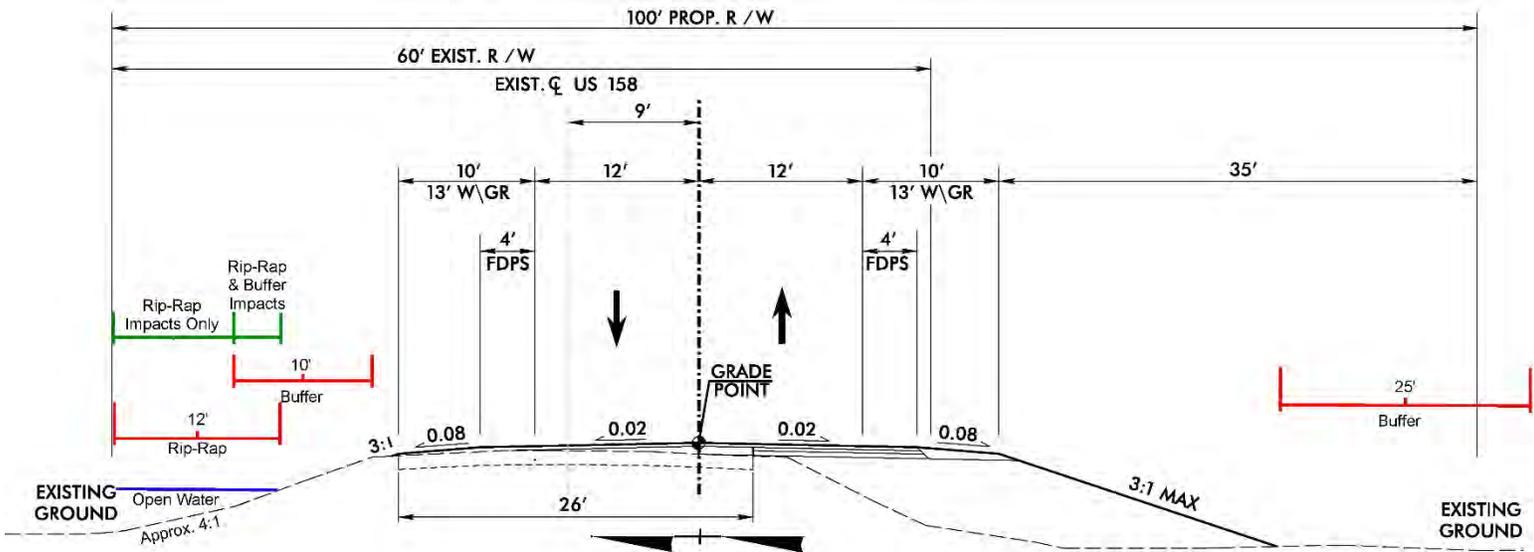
Alternative 1 and 2 Adjacent to the Refuge Proposed Typical Section
